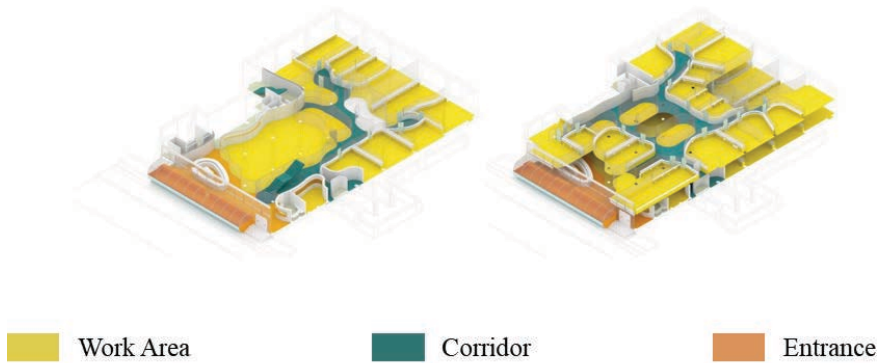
Ground and second floor plans (Image source: www.Archailly.com).
